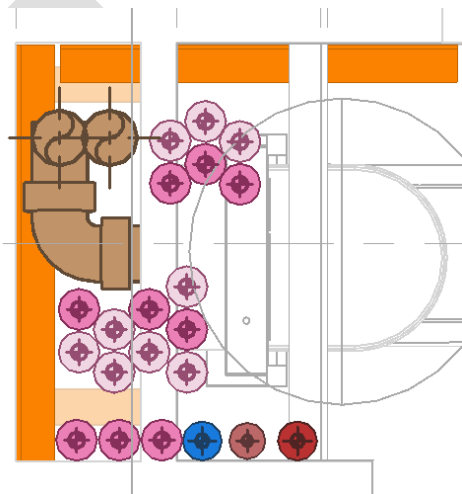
Plan of corner riser in bay. Due to the number of pipes at the upper levels, close coordination of the riser size, joist size and joist placement has been made to give assurances on feasibility.
